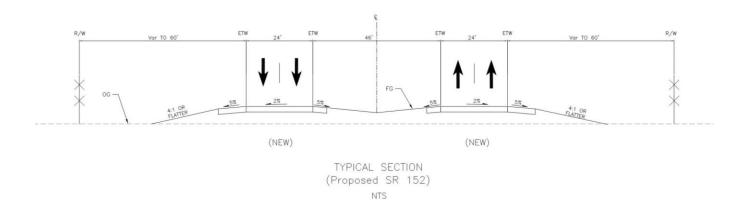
Proposed SR 152 NTC Typical Section (New Roadway Section)
